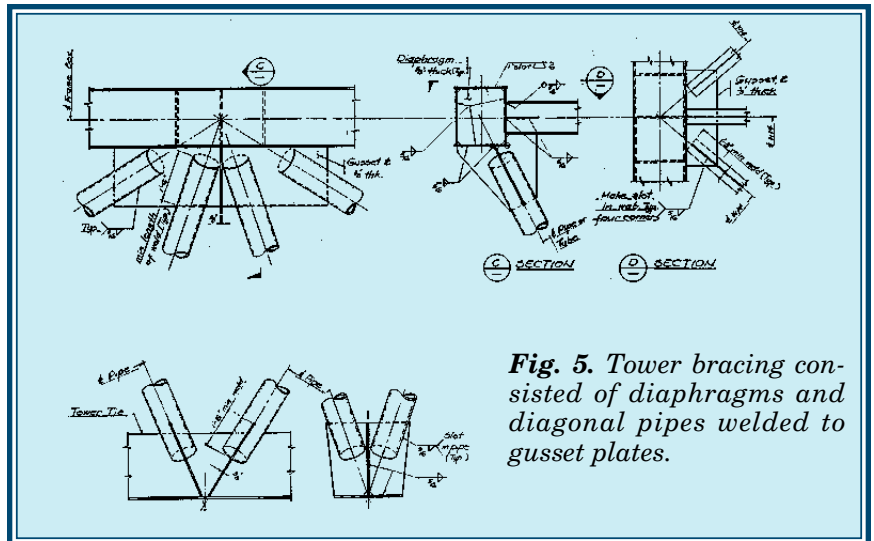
Tower bracing consisted of diaphragms and diagonal pipes welded to gusset plates.
